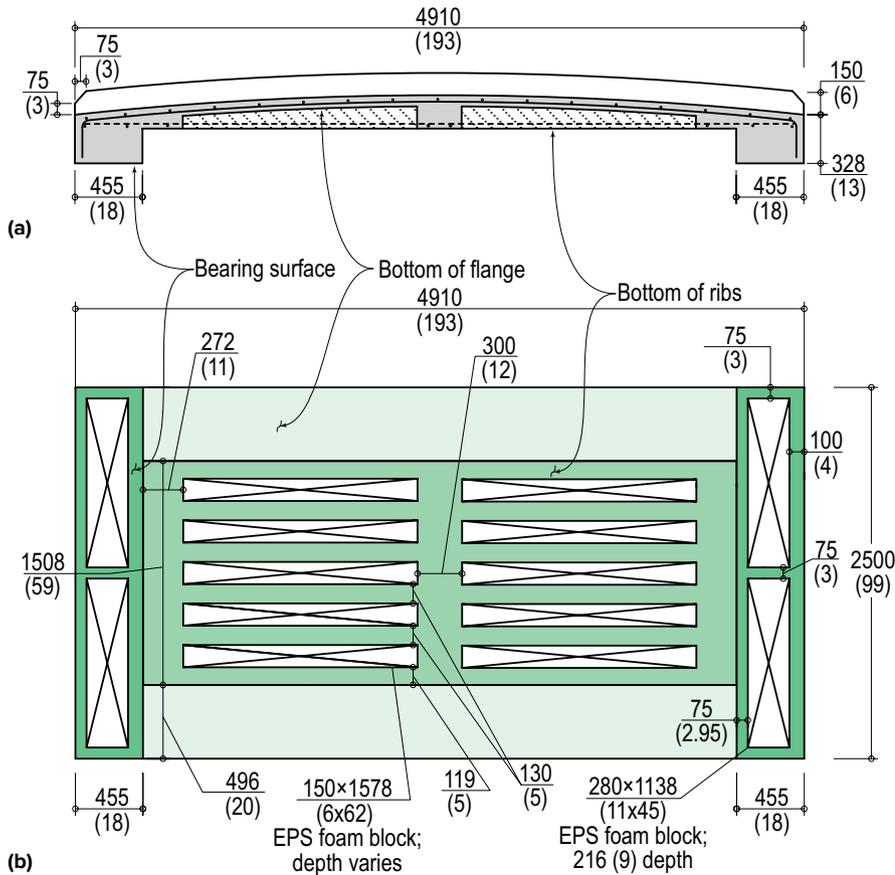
Bridge schematic: (a) longitudinal section at centerline; and (b) bottom view showing concrete dimensions. Dimensions are in mm (nearest in.)
